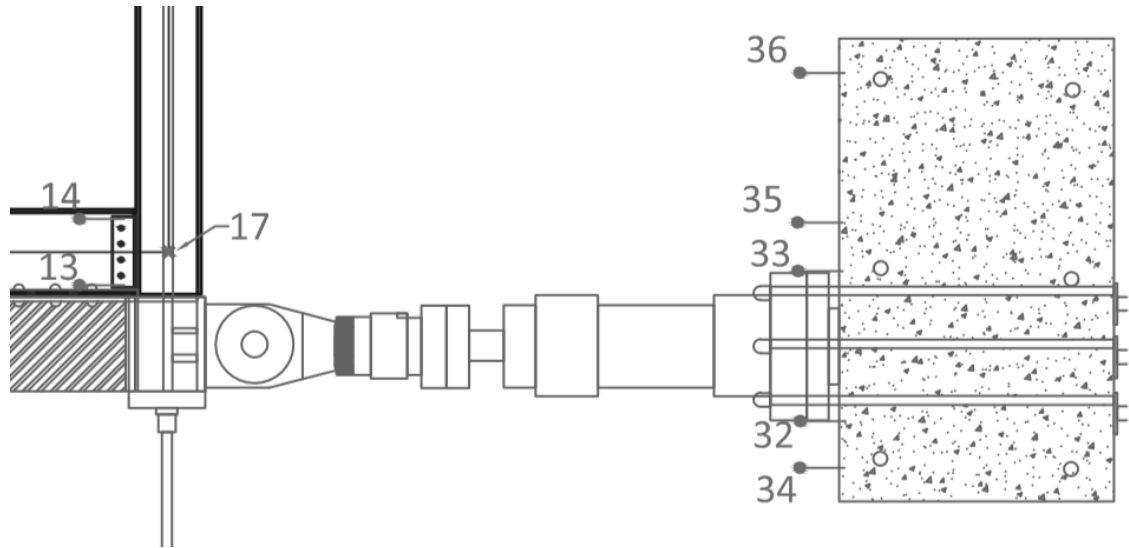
Typical Potentiometer Layout - Reaction Block
